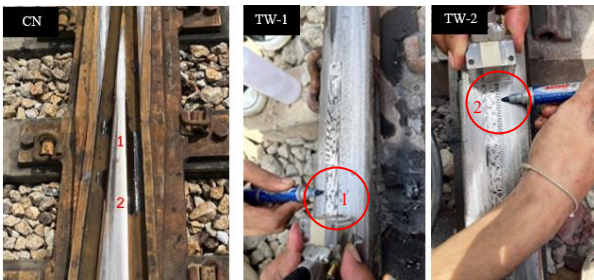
On-site testing on the crossing nose (CN) and Thermit welded rail joint (TW)
